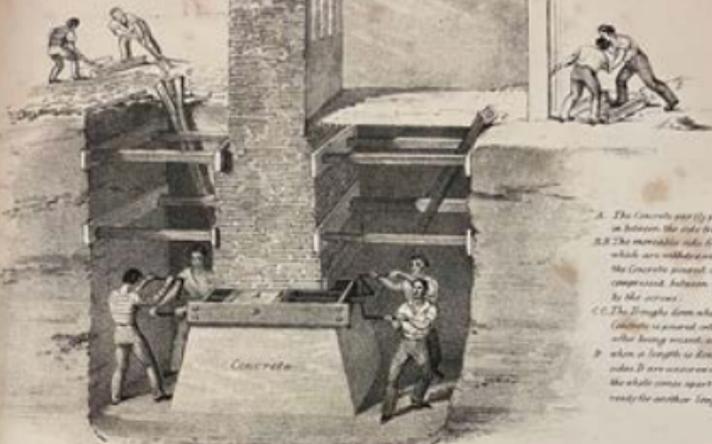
Sections showing the Method of underpinning with Concrete, the Store House, Chatham Dock Yard.
